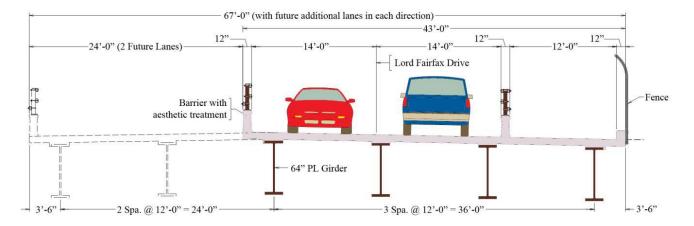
Transverse Section of Lord Fairfax Road Bridge
